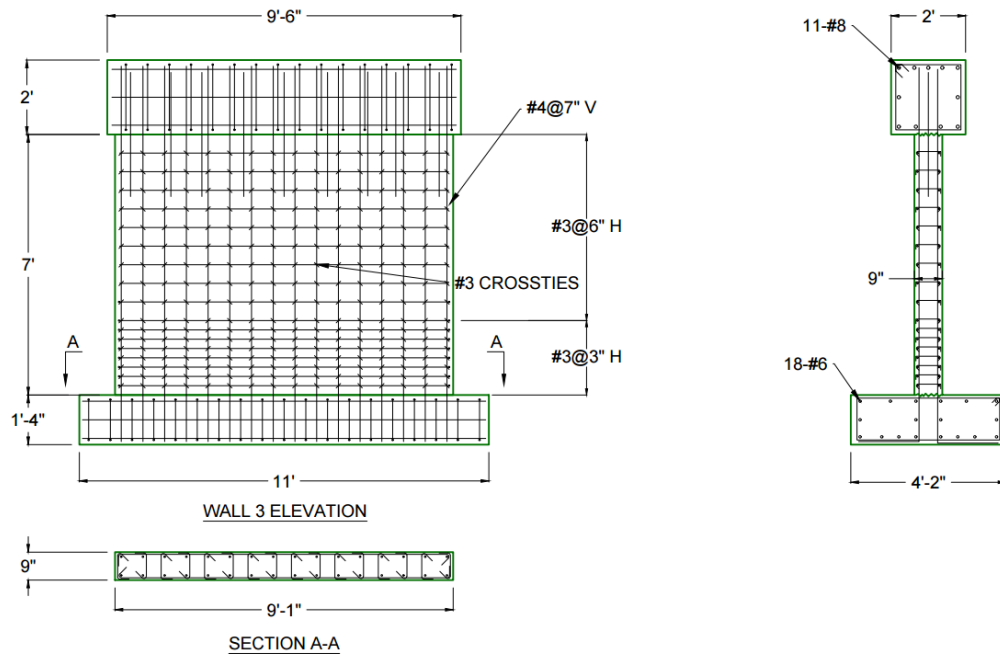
Typical specimen dimensions and detailing for Walls 1-3.
